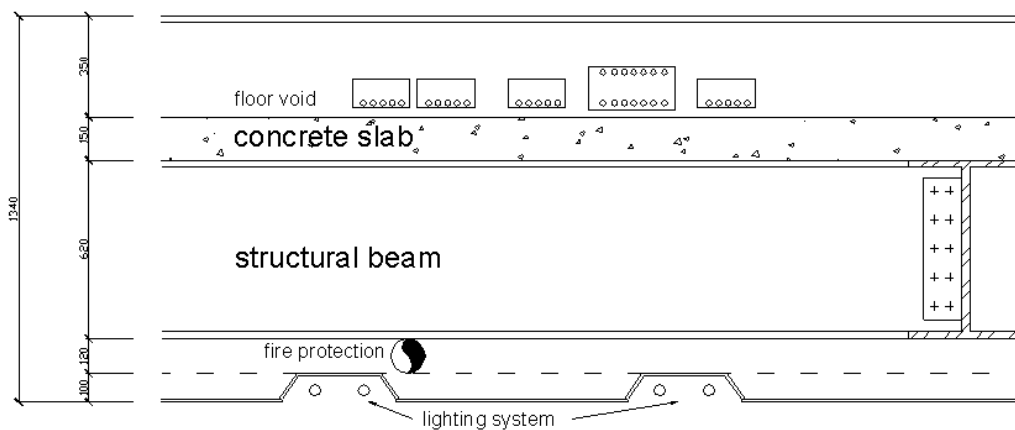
Ceiling and floor voids of underfloor air conditioning system
